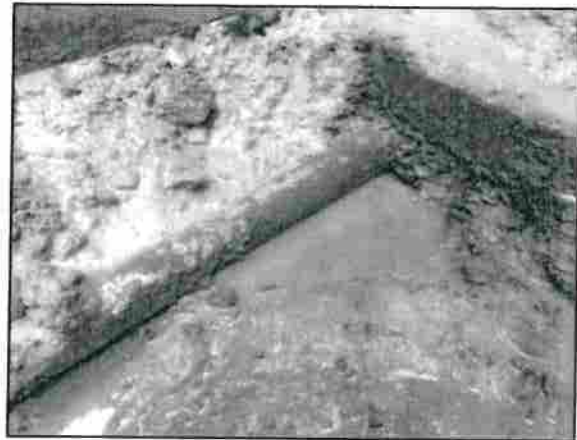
Steel 2-1/8" diameter anchor rod with no significant deterioration.
